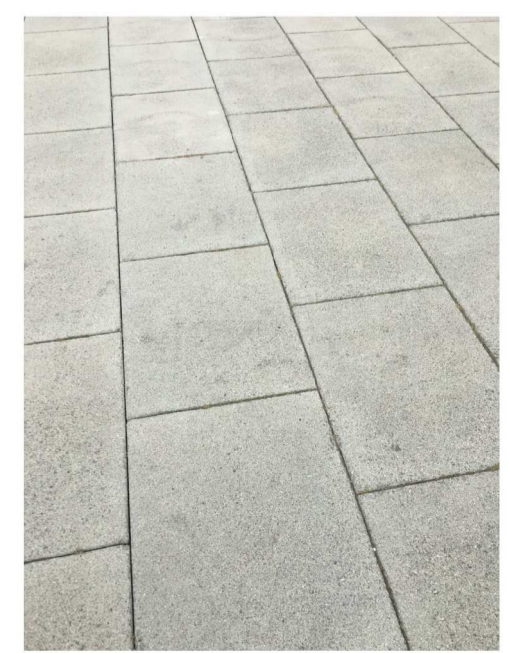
EXISTING CONCRETE BLOCK PAVING AT SOUTH STAND
